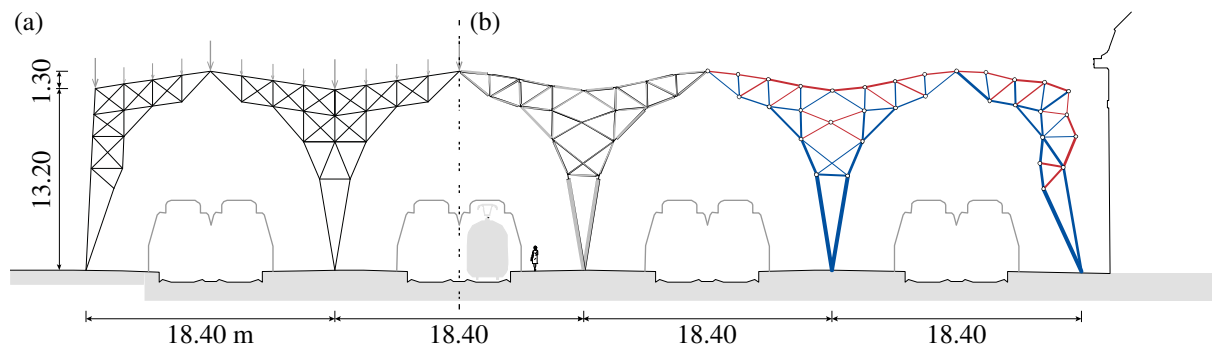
Transversal roof section: (a) initial ground structure, (b) final layout and force distribution
